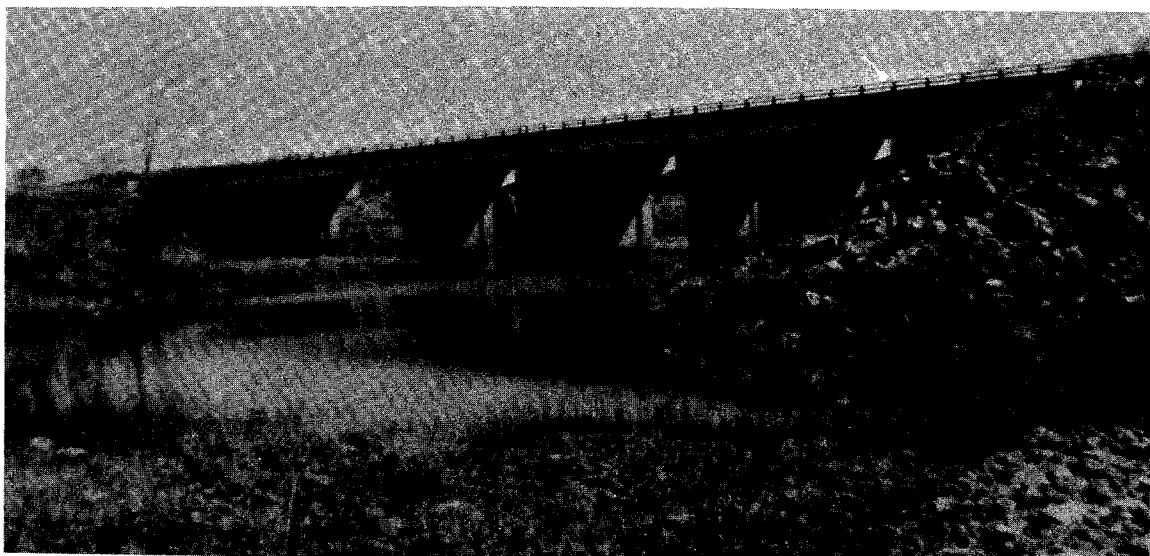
View in 1976 of spur dike and scour hole upstream from right abutment. Note orientation of bridge piers to right bank overflow channel.
